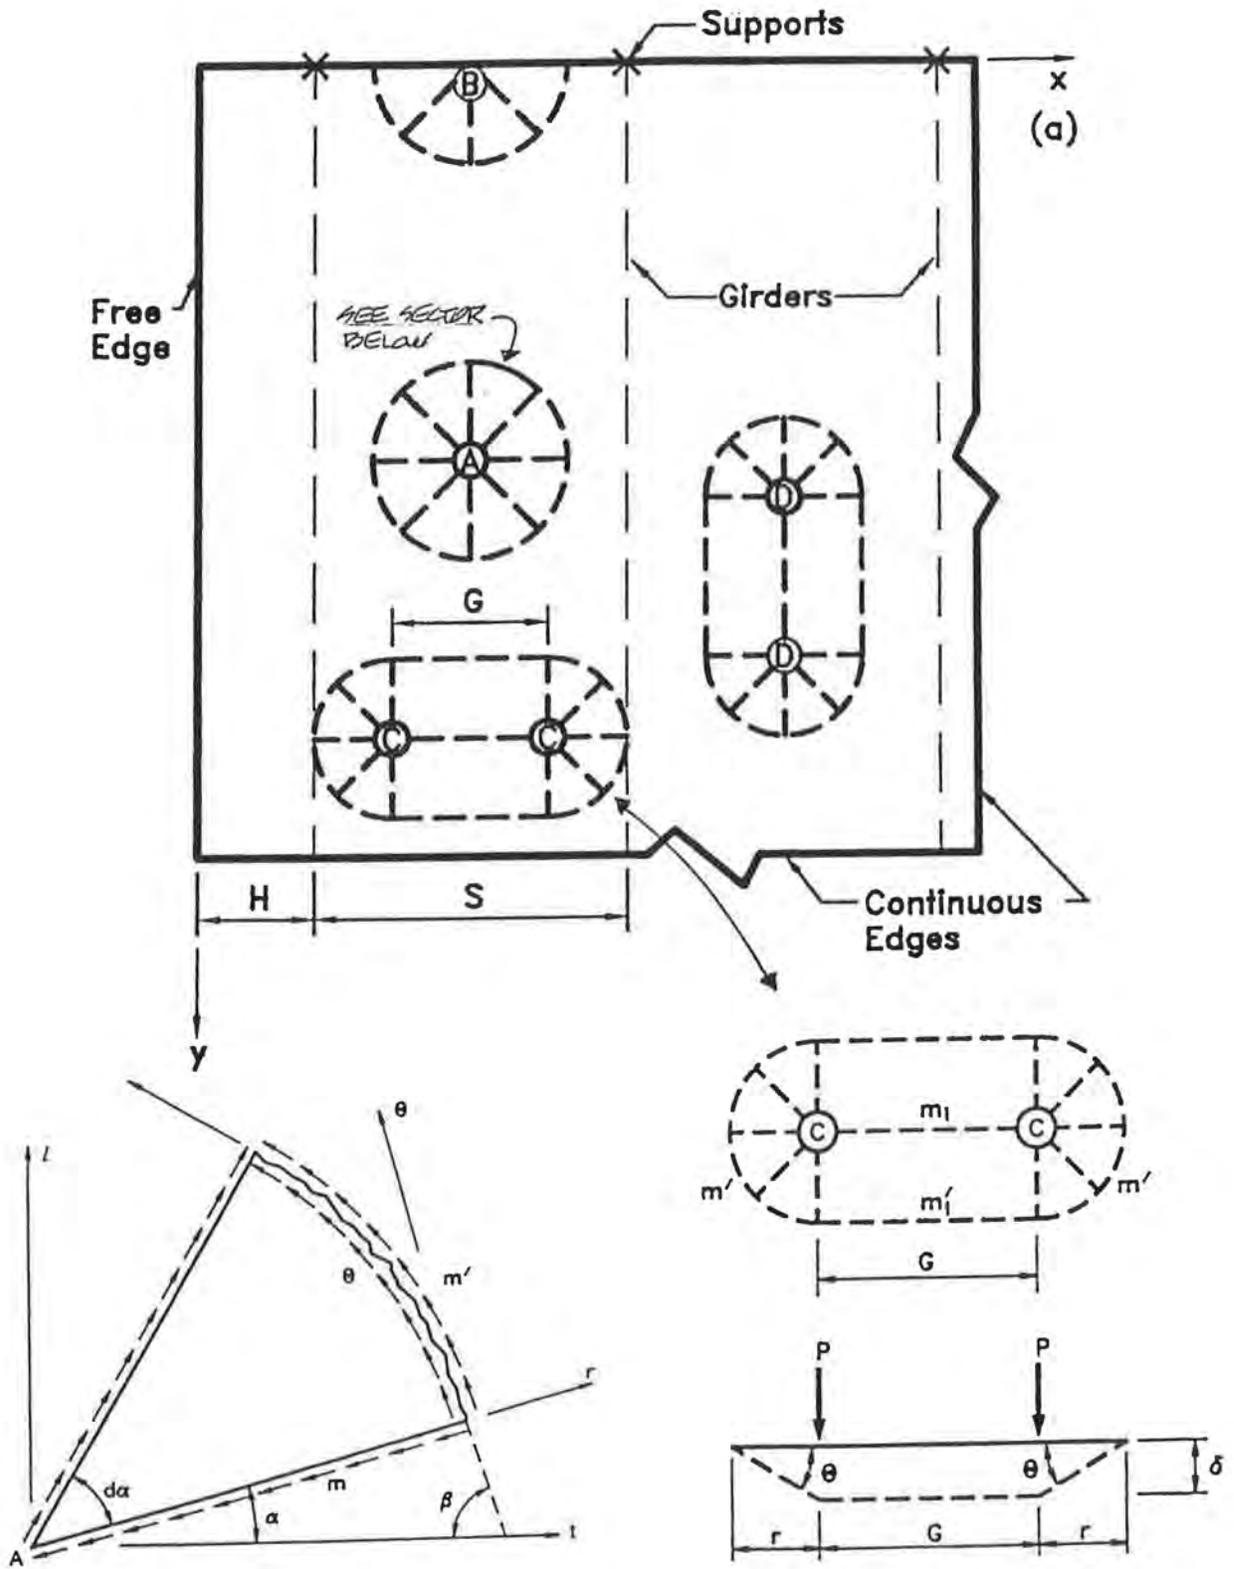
Portion of Deck Slab Showing Load Positions (6)
